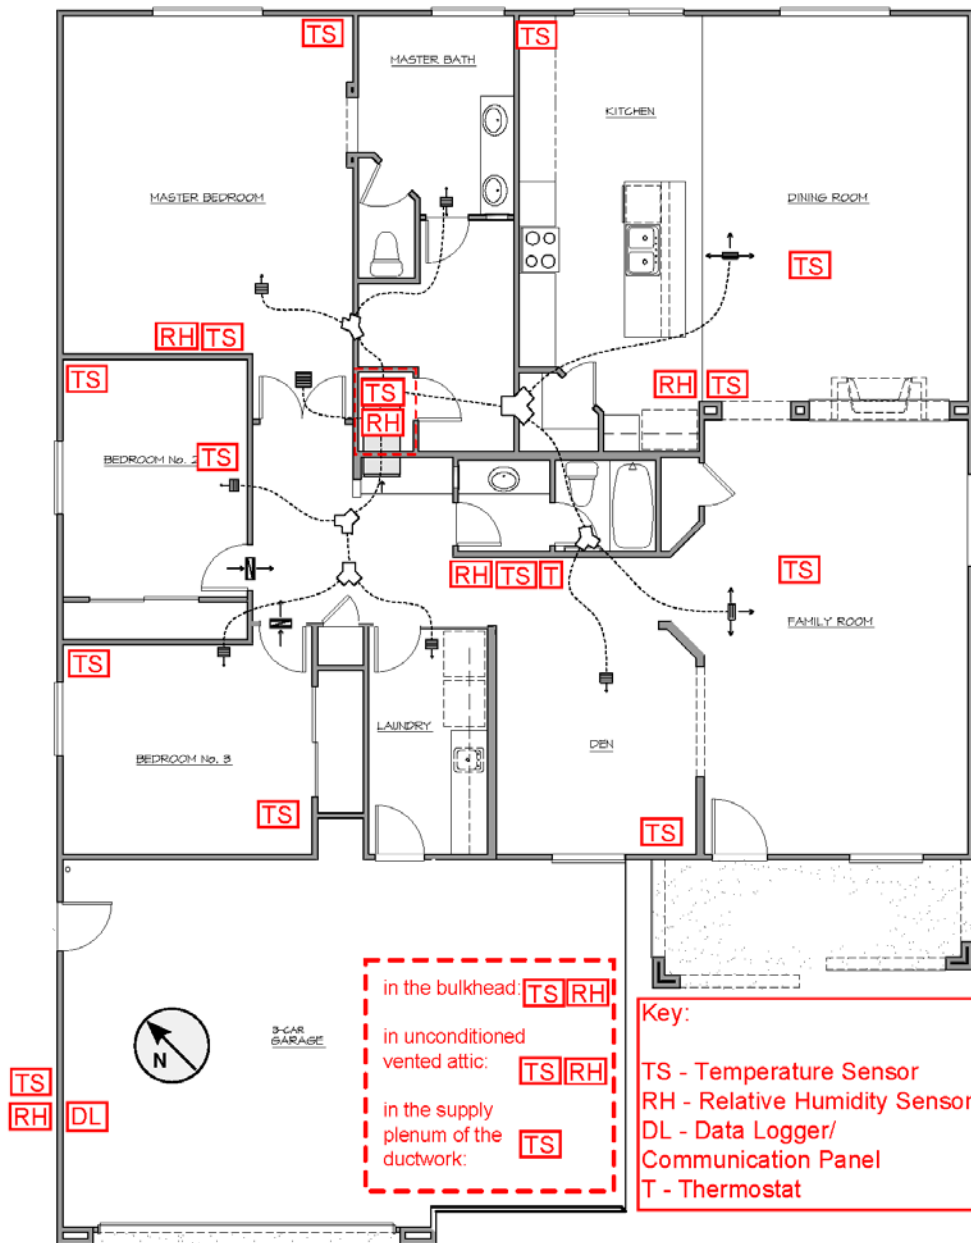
Floor plan showing sensor locations, duct layout, and supply register locations
